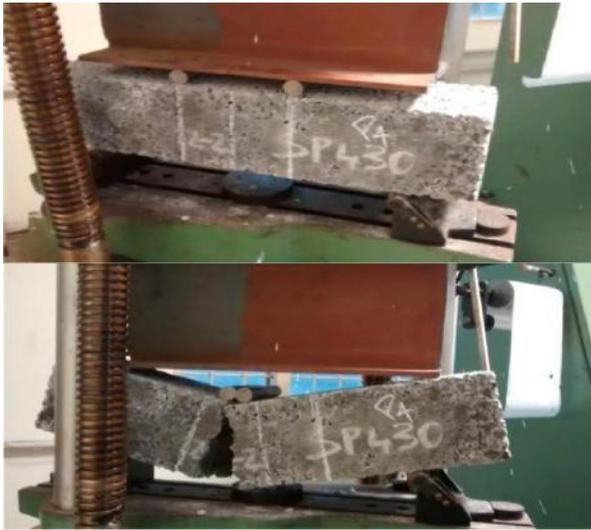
Loading and failure of pervious concrete beam with Conplast SP 430
